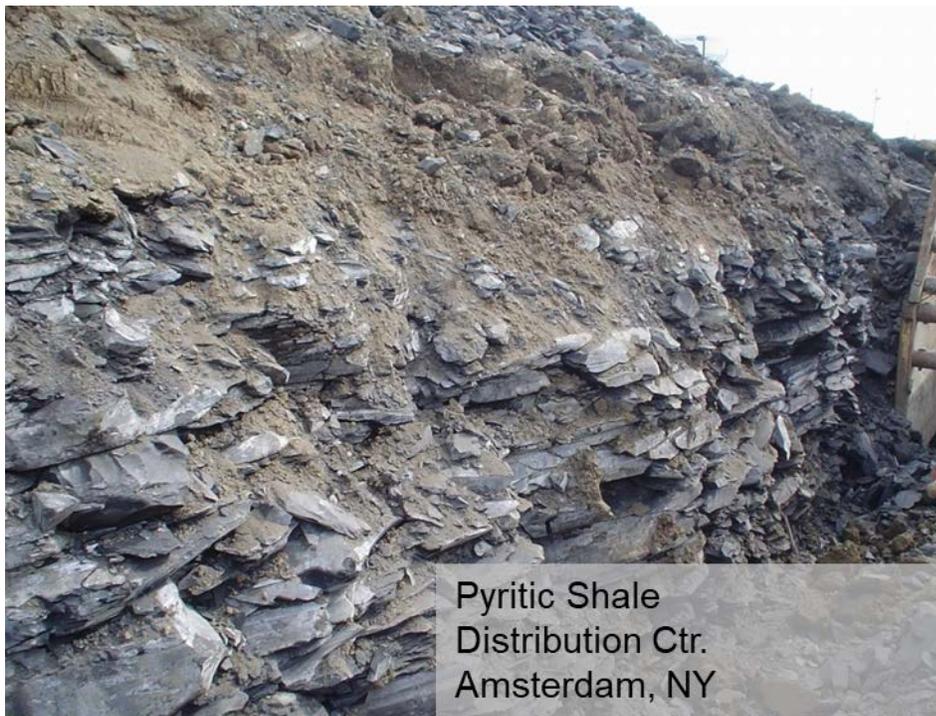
Removal of expansive shale in preparation for foundations and slab-on-grade
